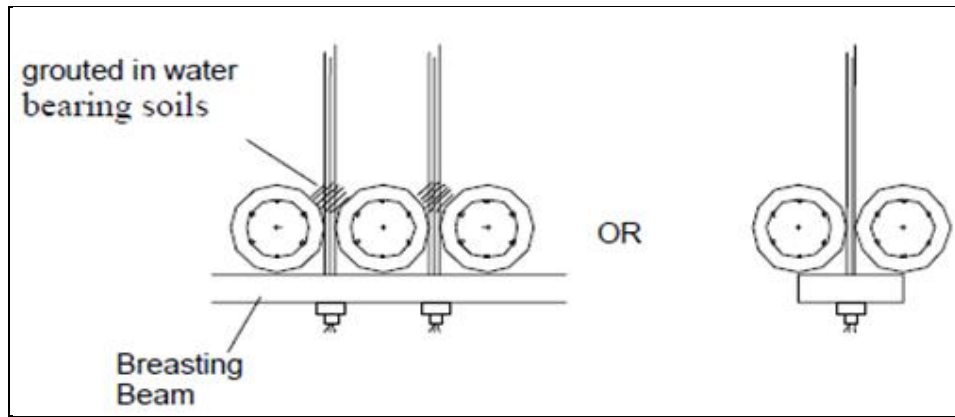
Typical section of anchored contiguous Pile wall [2]
